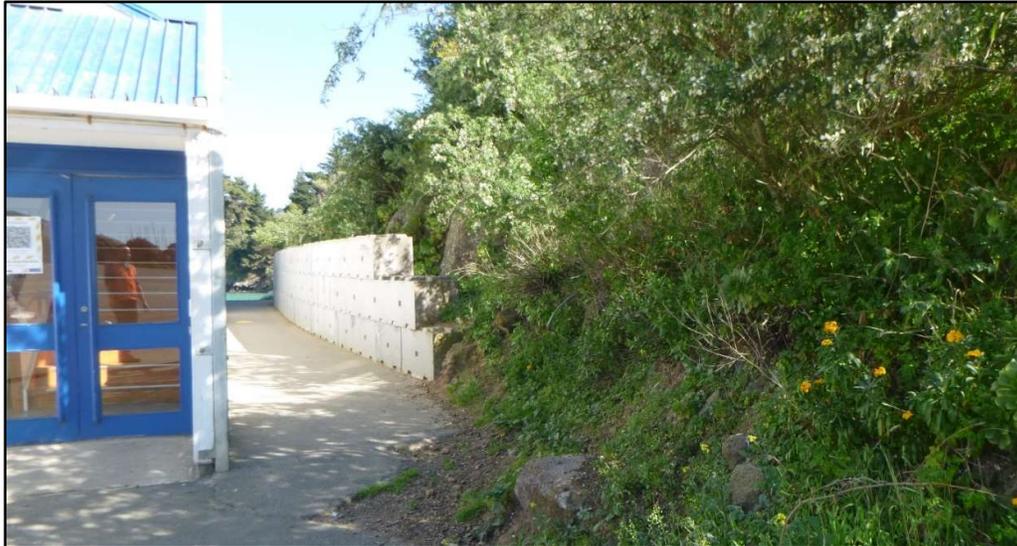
Concrete block wall behind the Yacht Club and the earth bund adjoining it on the right of the photo.
